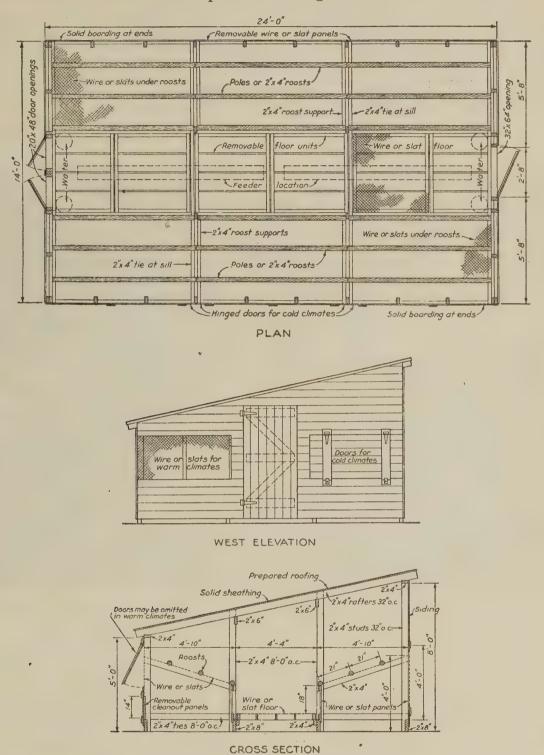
A permanent range shelter with center alleyway. Can be made any length desired and can be built with a gable roof. (S. J. Marsden, U.S. Department of Agriculture.)
